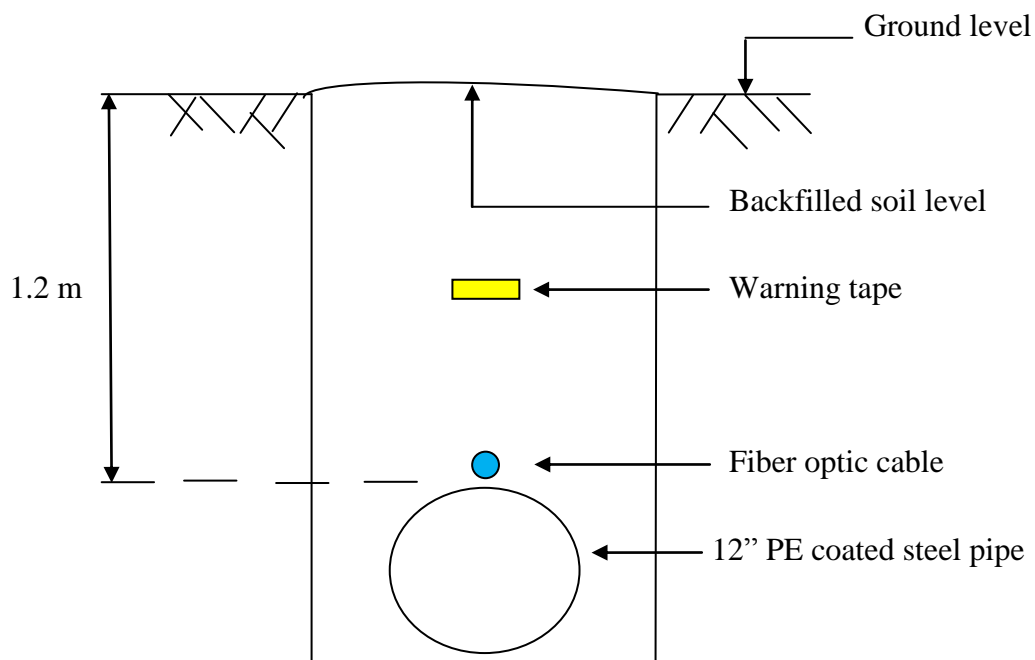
Buried 12" PE coated steel pipe with fiber optic cable
